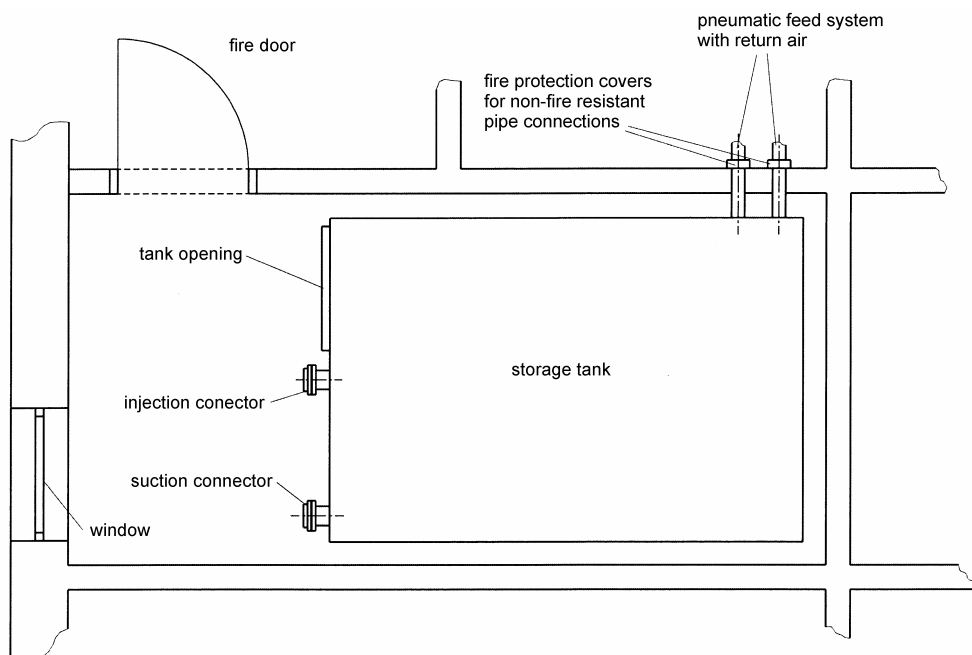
Example of the installation of a pellet storage tank with interior connectors
